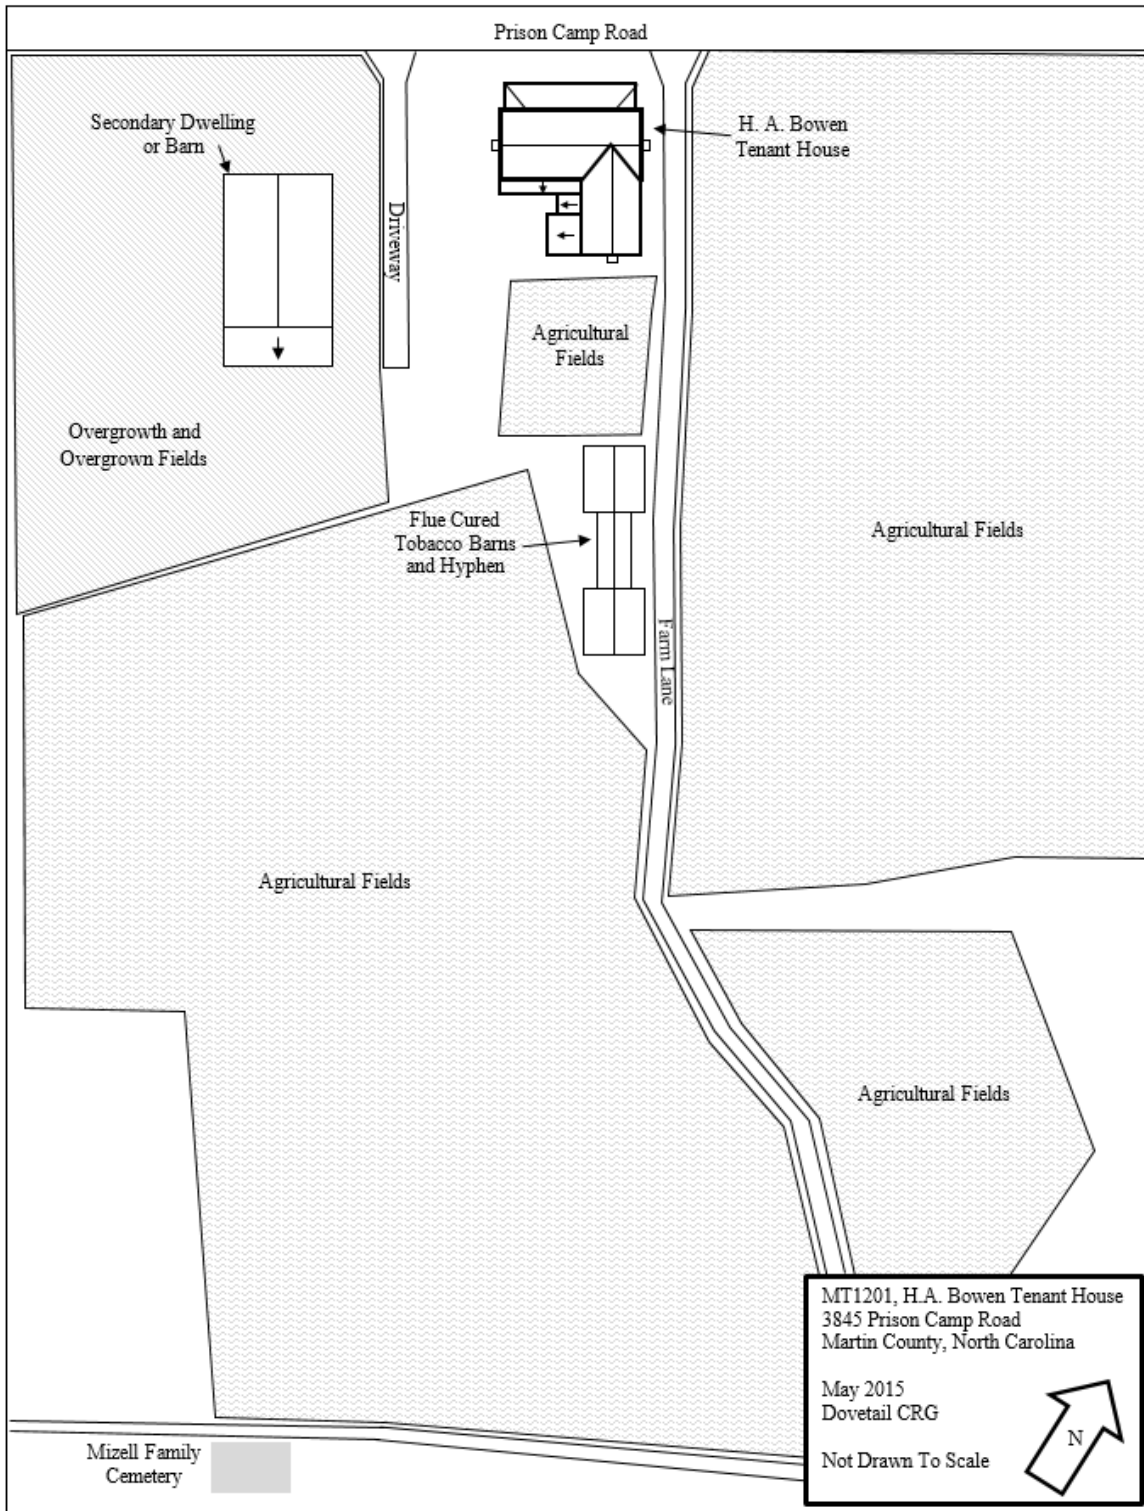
The H. A. Bowen Tenant House (MT1201) Site Plan.
